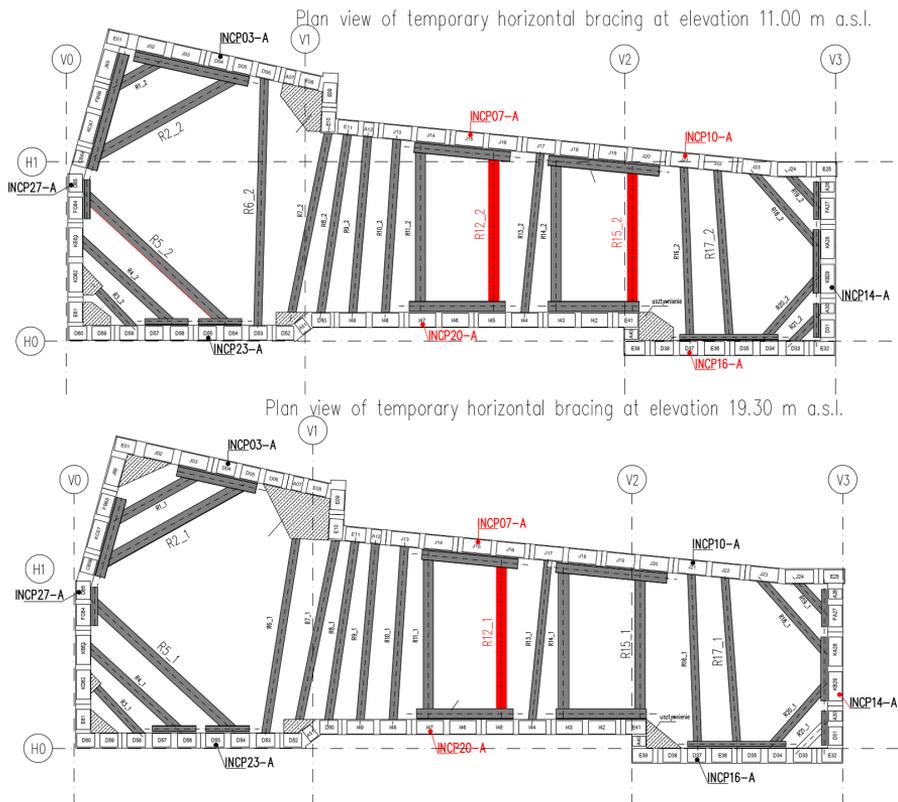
The plan view of bracing of diaphragm walls in both levels (B1 at elevation 11.00 m and B2 at elevation 19.30 m), locations of inclinometers (INCP) and analyzed steel struts [17]
